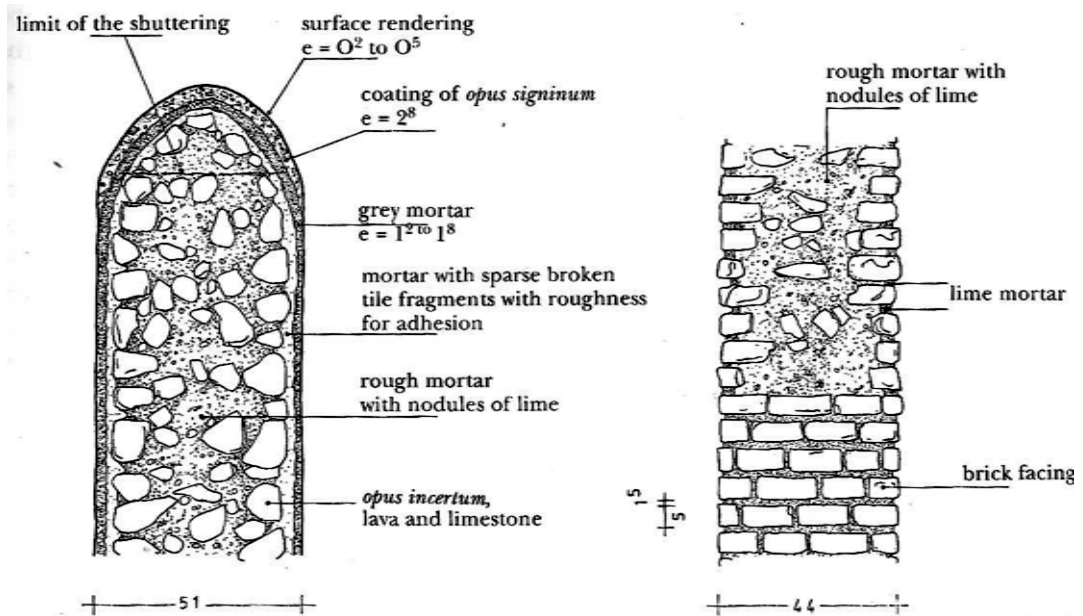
Masonry wall section in ancient Roman period (Adam, 2005: 77)
